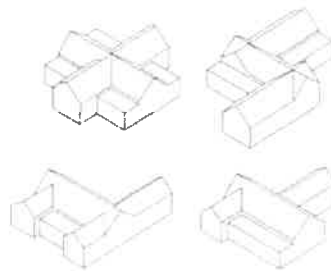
Illustration of different building forms that can be created by variation on the letter of the alphabet plan form and the use of abutments
